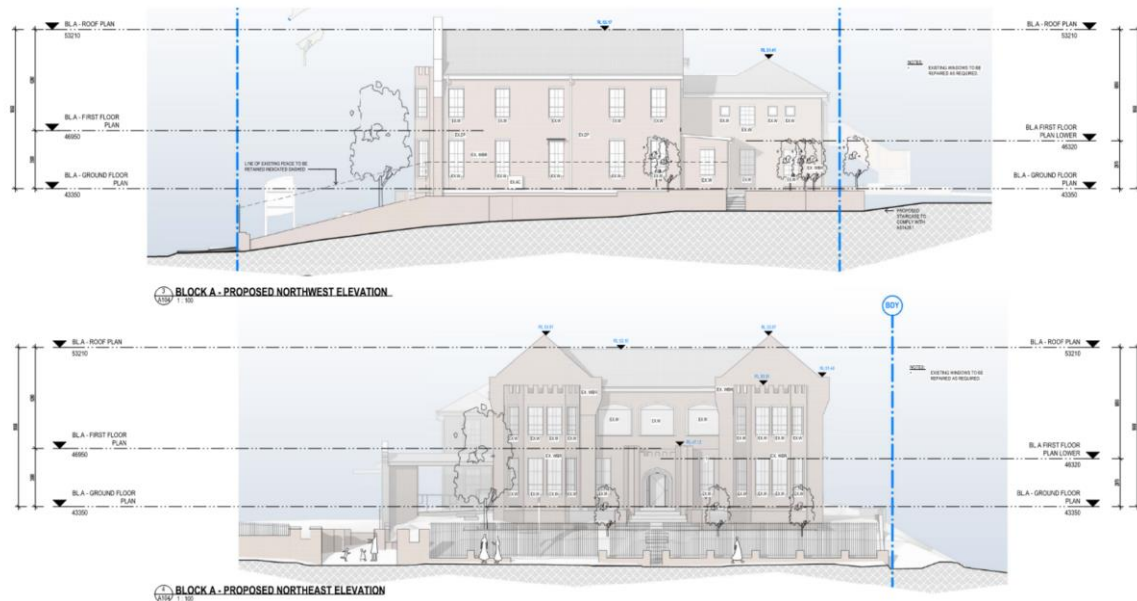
Proposed north-west and north-east elevations (Source: Leaf Architecture)
